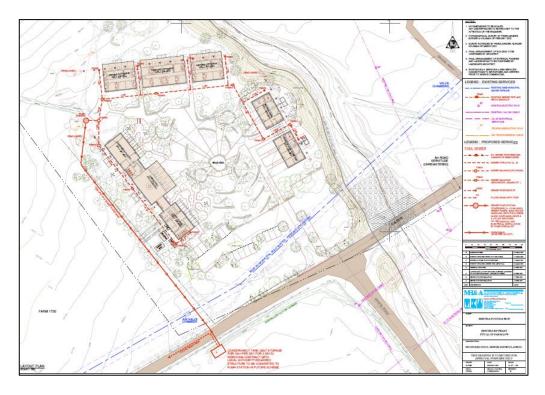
Layout for the sewage treatment infrastructure for Alternative 3. Sewage will be collected from all units and pumped using a pump located in the north-western corner of the site, via a rising main to a conservancy tank to the south of Hoof Pad.
